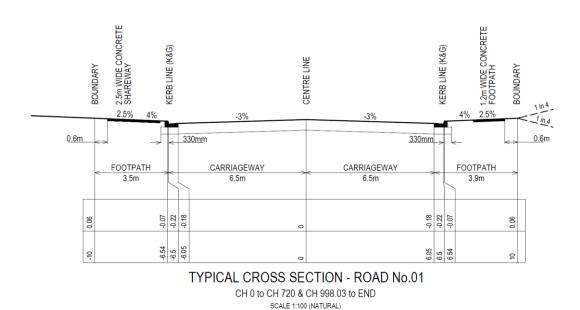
Estate Road – Typical Cross Section (as adopted)
